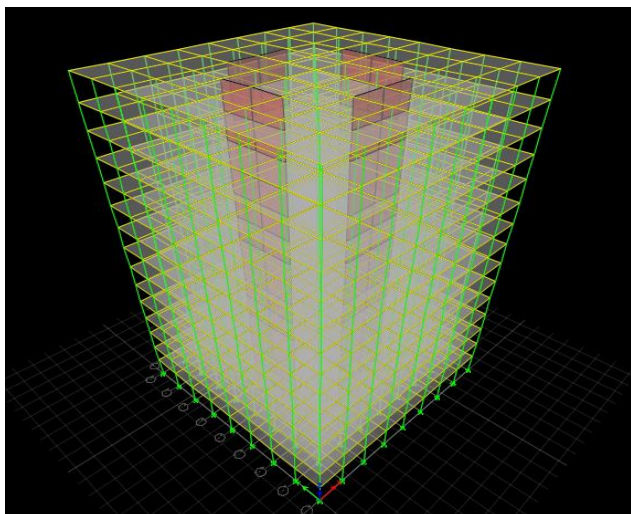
3D view of model with Shear Wall Position-4 (SWP-4)
